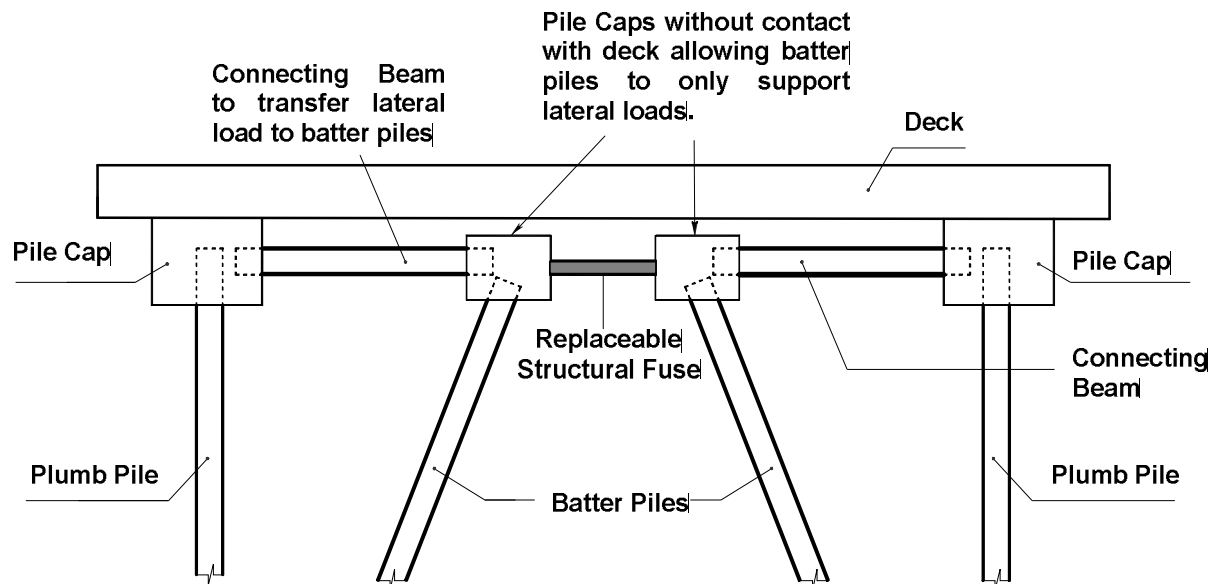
Proposed Detail for Combining Batter Pile and Plumb Pile
